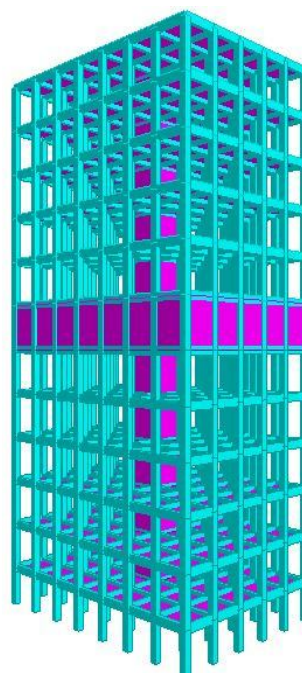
Actual 3D view of case (RA4) Residential Apartment with Shear core outrigger and wall belt supported system after rendering
